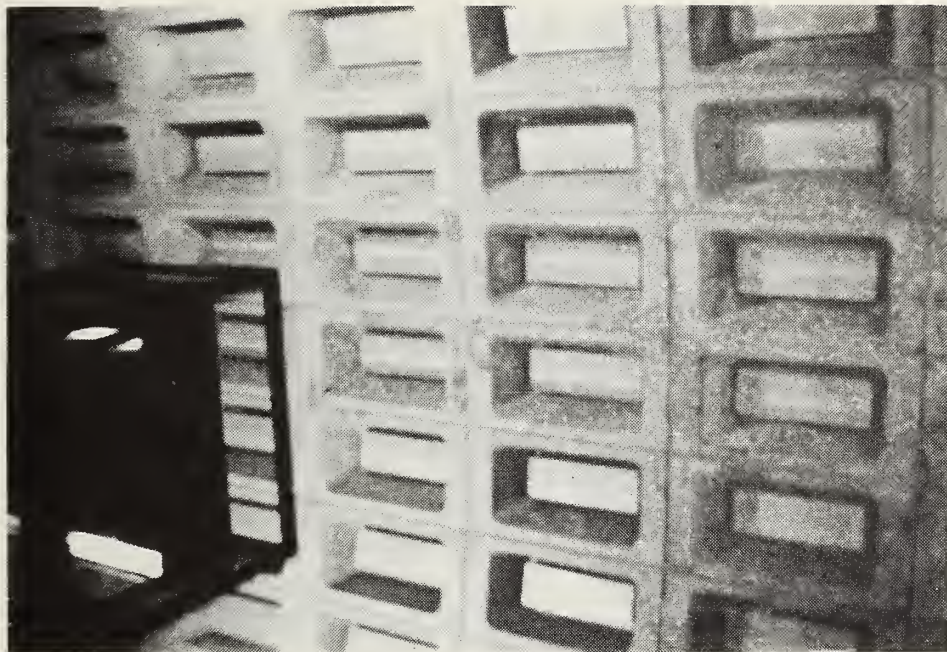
LEAKS THROUGH PRECAST AND CAST-IN-PLACE CONCRETE WALLS
